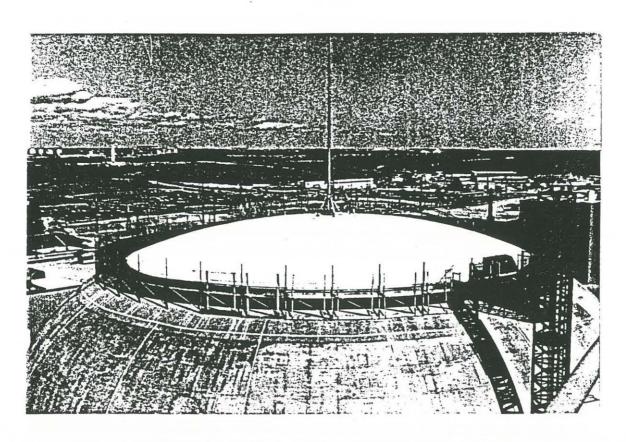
Pickering NGS 'A' Unit 1 after concrete coating applied.
